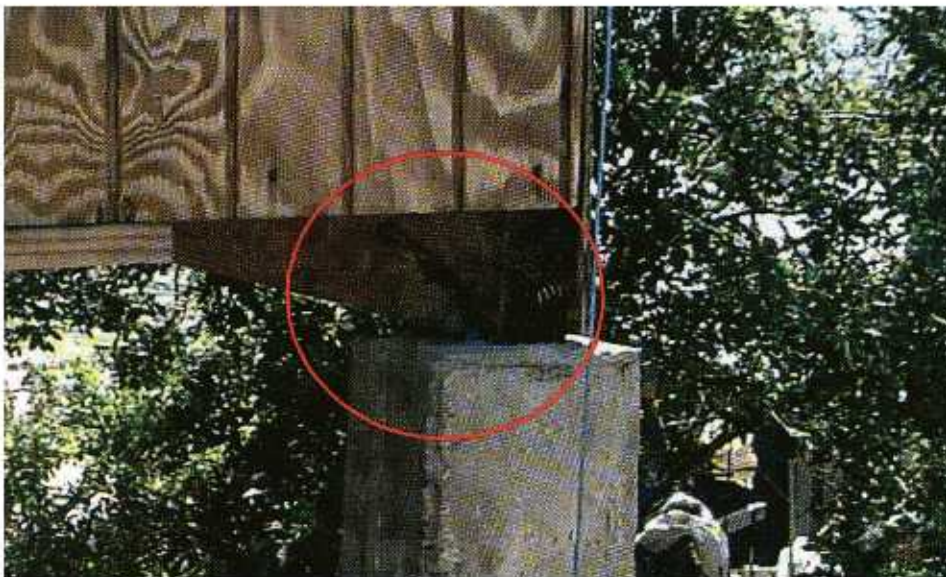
Example of a non-engineered connection between the building foundation (concrete column) and the floor system. The wooden floor beam is connected to foundation rebar with an improper nailed connection.
